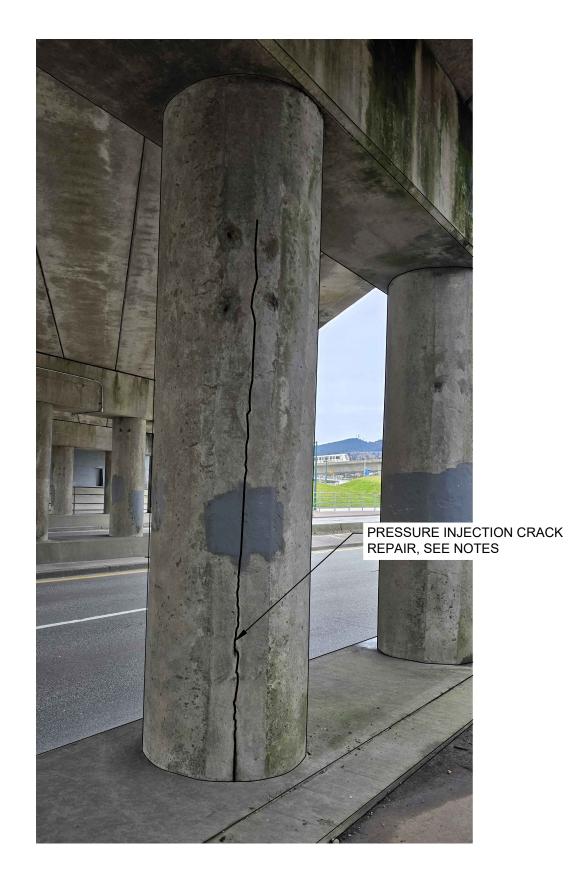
PHOTO N.T.S. TYPICAL VERTICAL CRACK SEAL IN CONCRETE COLUMNS
